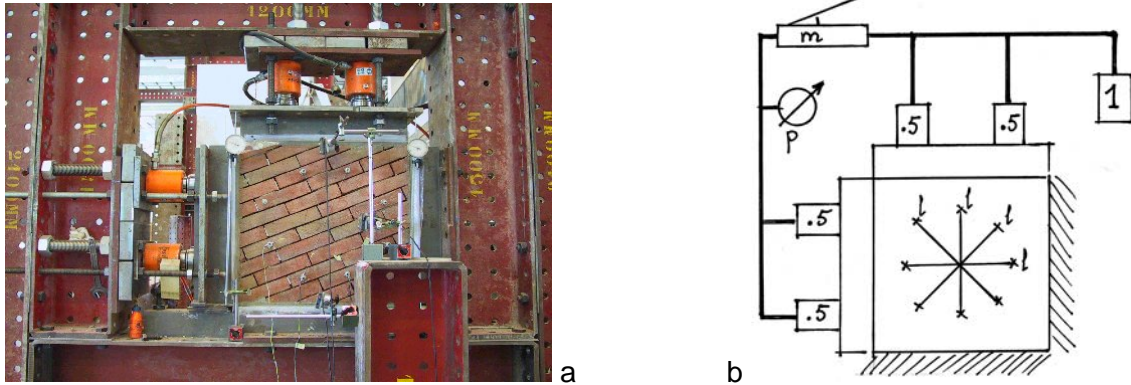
a) Test frame and b) hydraulic scheme and position of LVDTs
